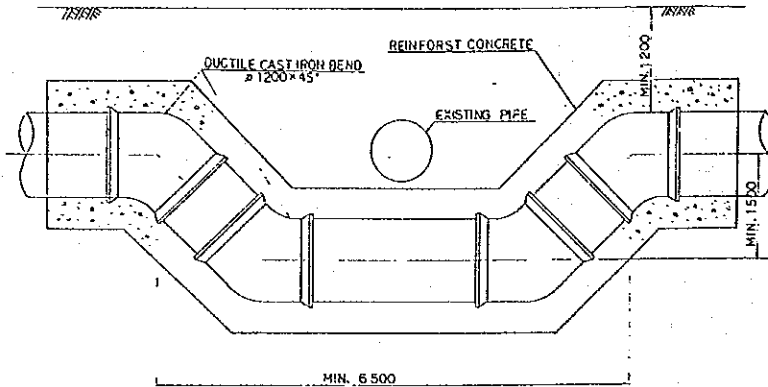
TYPICAL SECTION OF PIPE LAYING S-11-40
